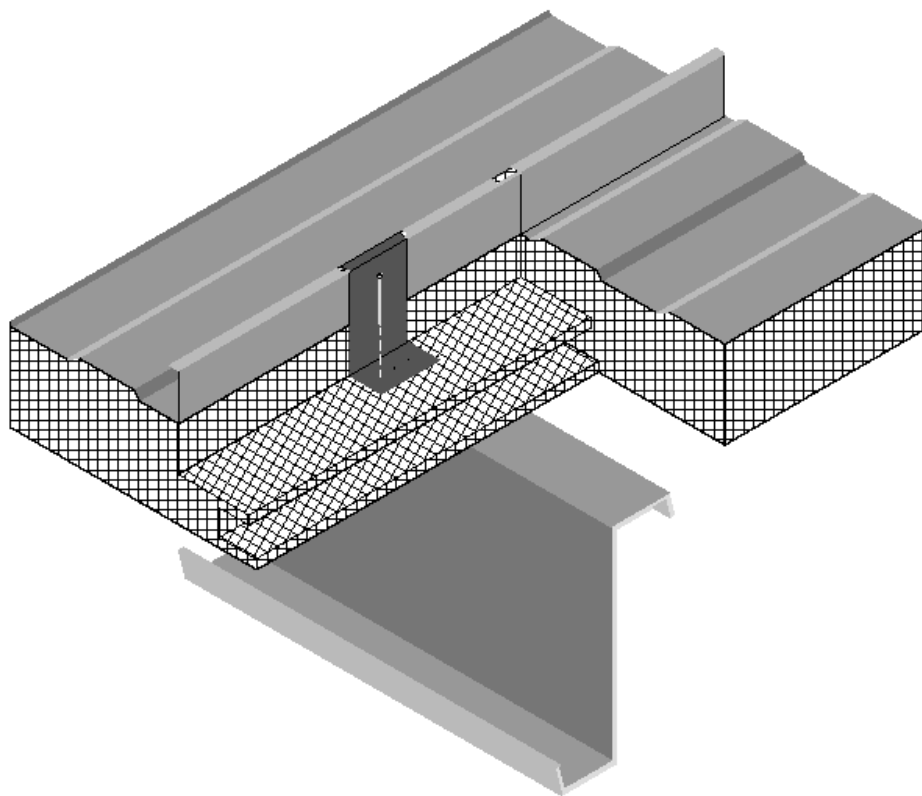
Insulated Ceiling with Removable Panels
